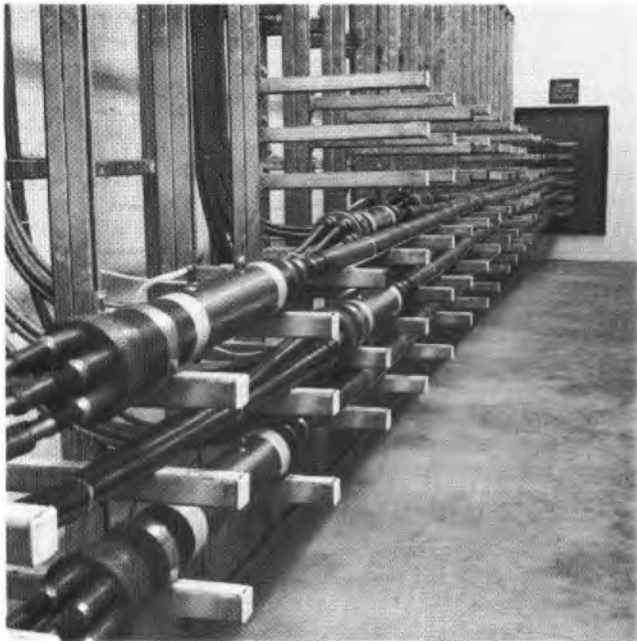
The 60 MHz cabling arrangement in High Wycombe cable chamber
